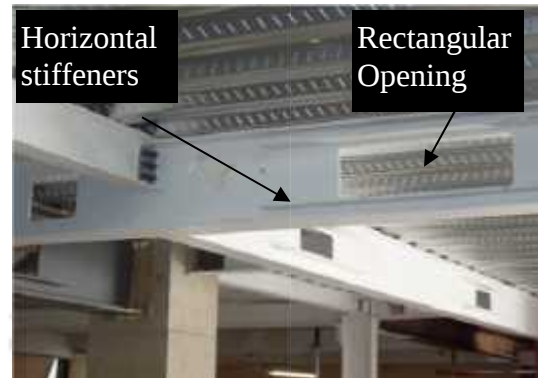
Horizontal stiffeners for rectangular opening in webs of steel girder (SCI 2011)
